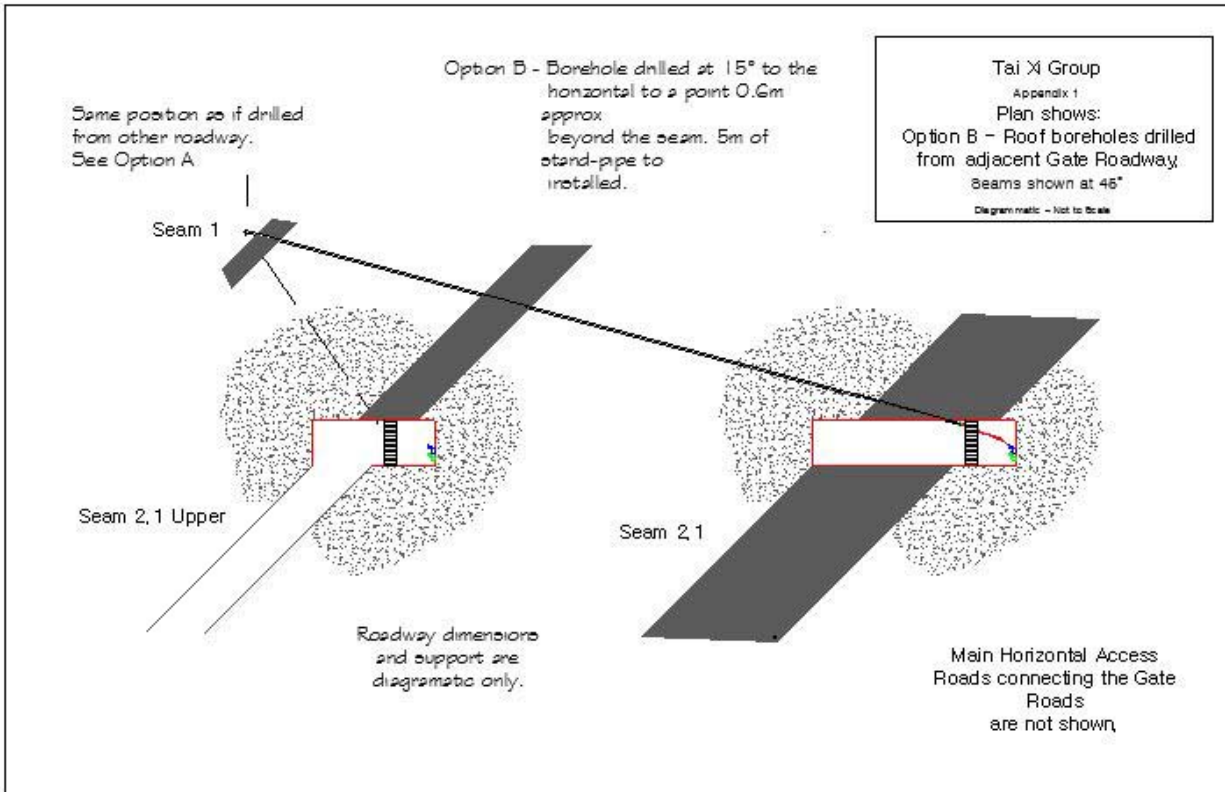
Drawing Showing Roofhole Design Drilled from a Third Gate
